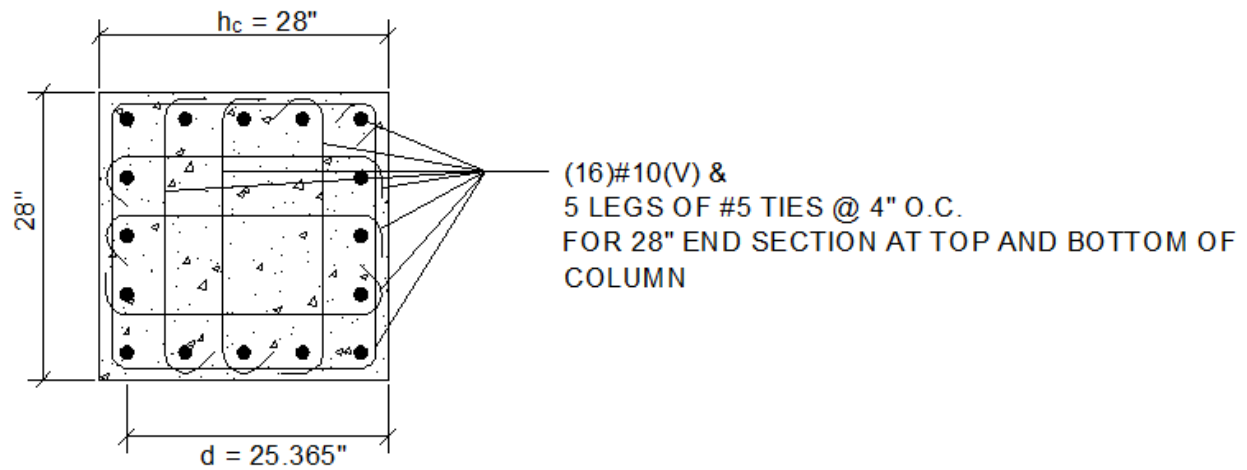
Exterior column, cross-section at end of column at ground floor level based on tsunami design requirements.
